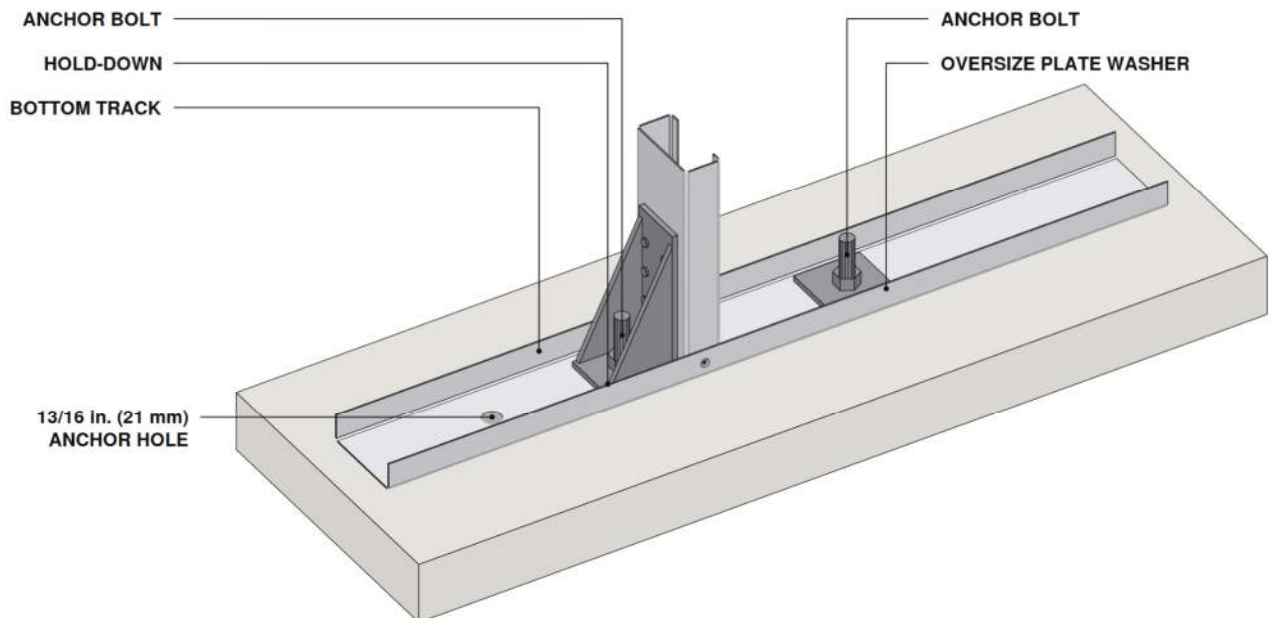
Bottom-track anchor holes serving a hold-down and an anchor bolt connection
